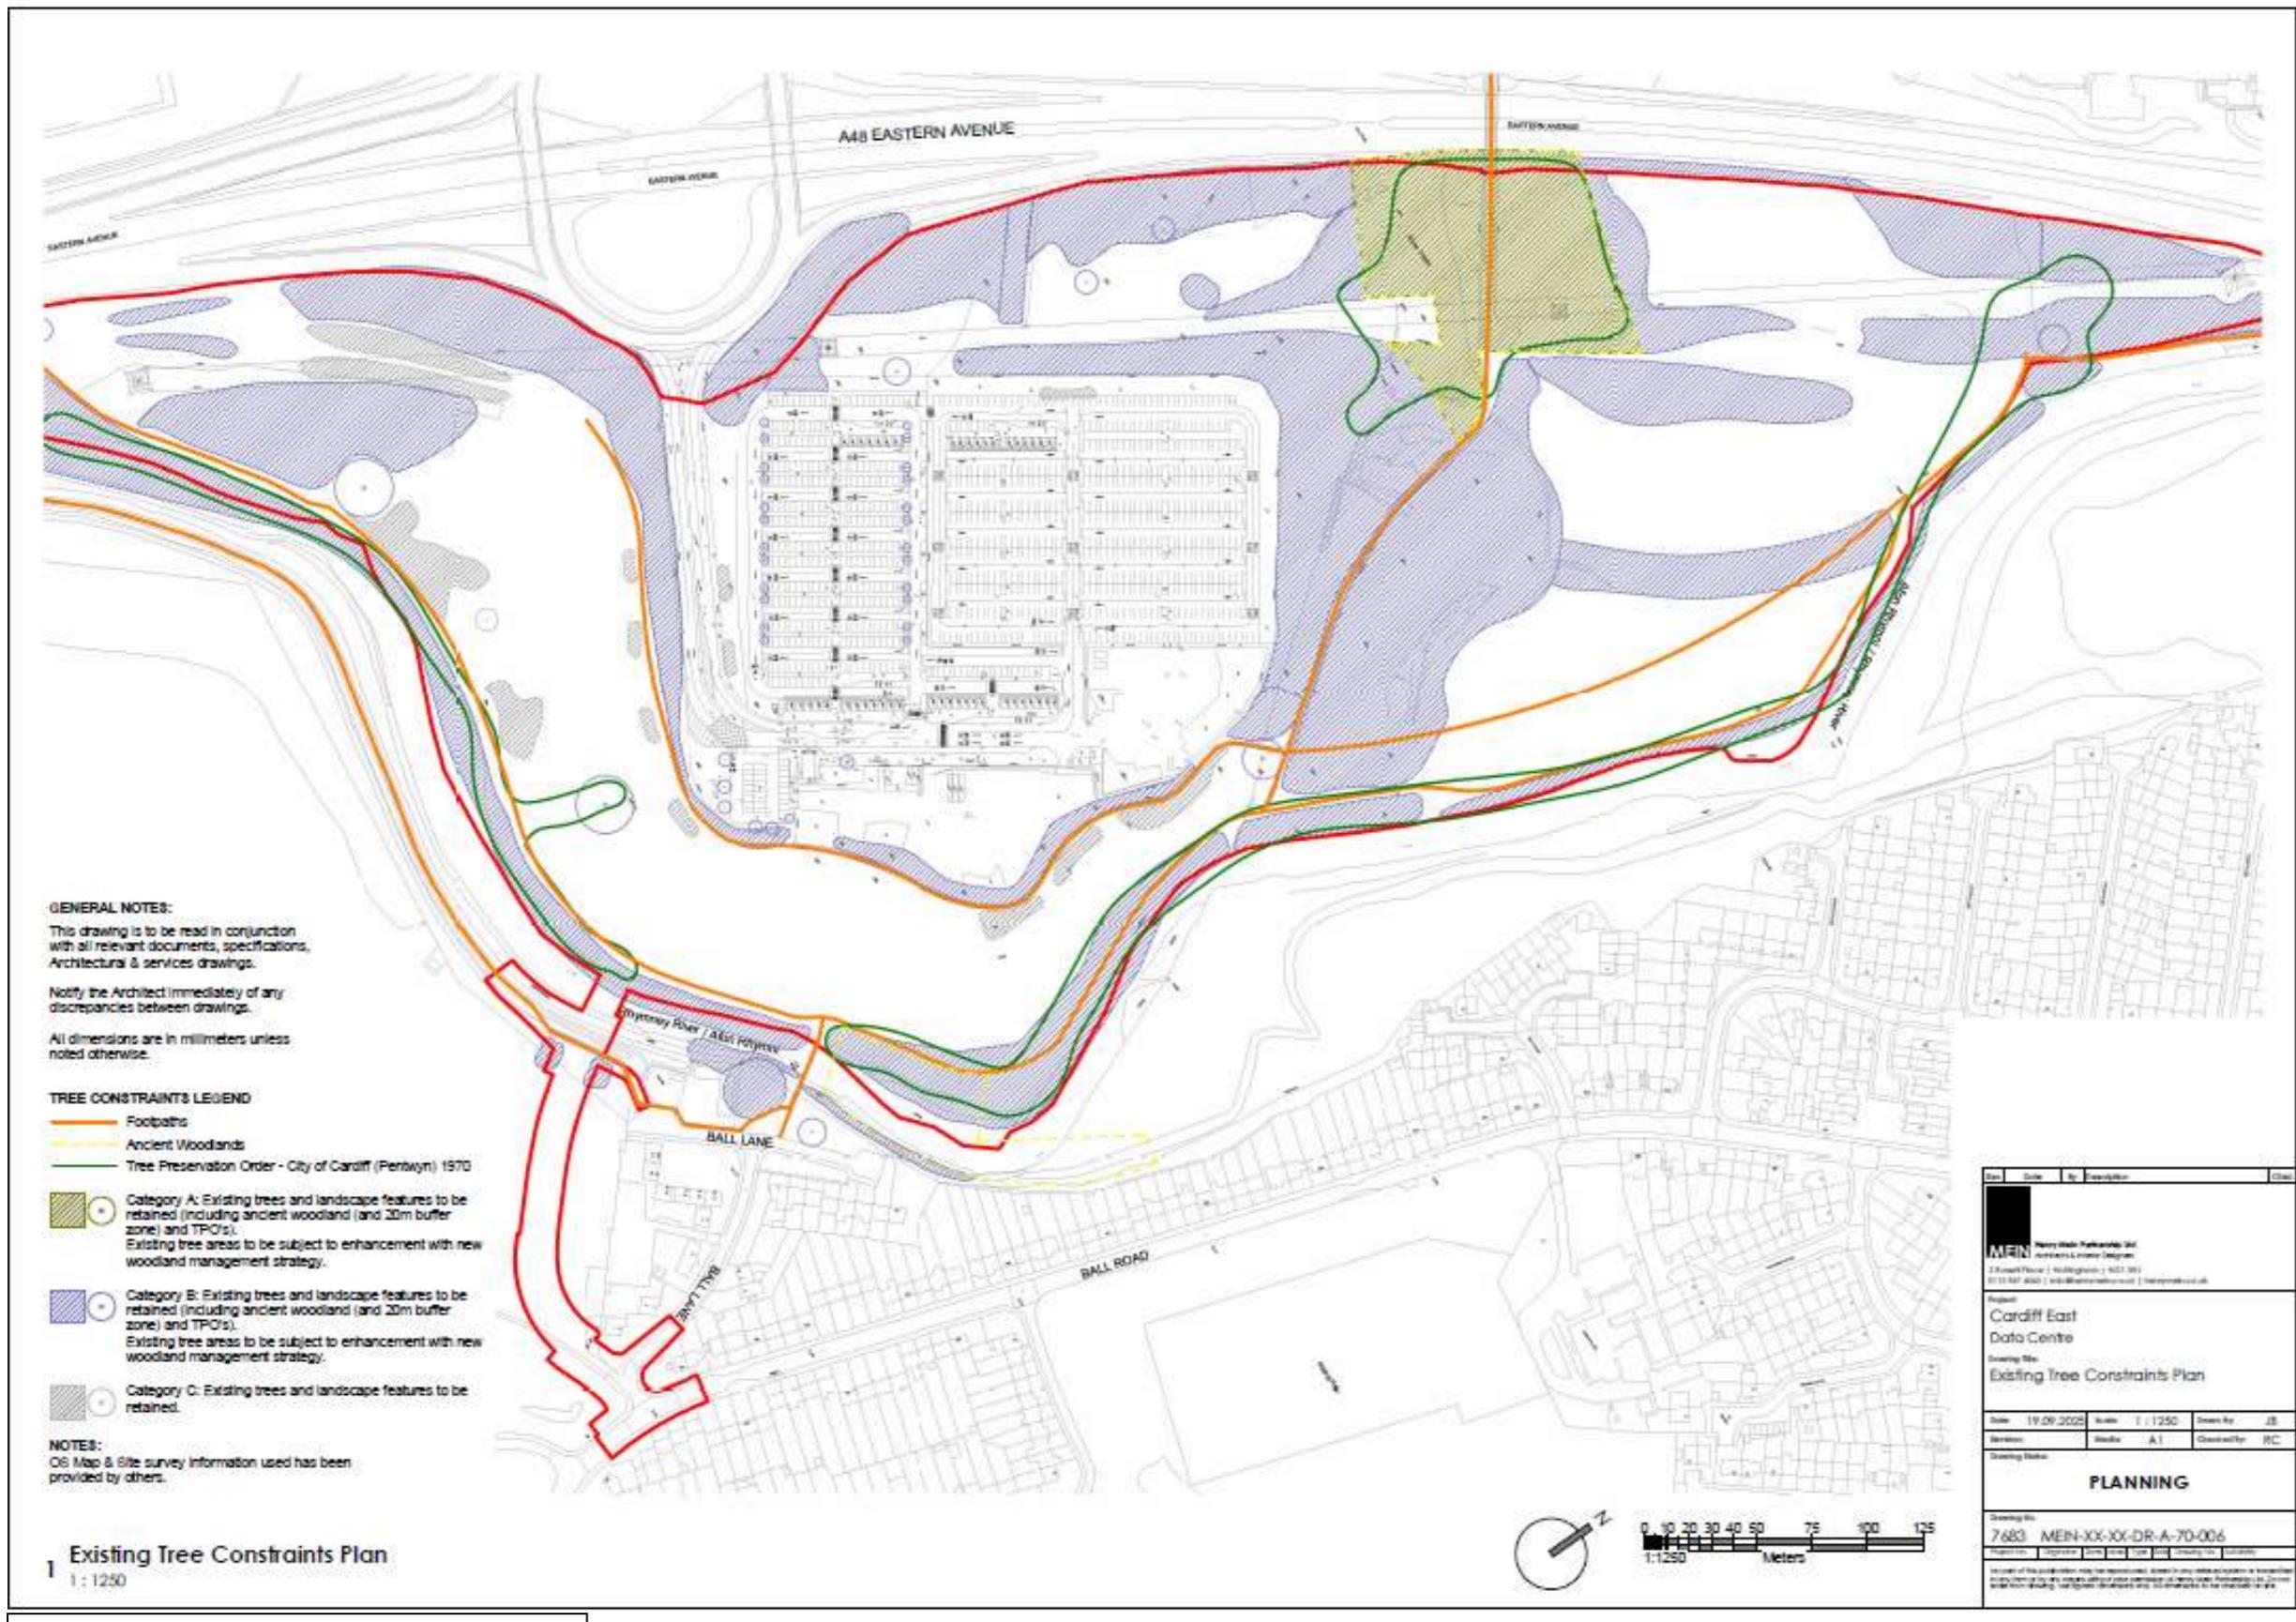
Existing Tree Constraints Plan (for reference only)
